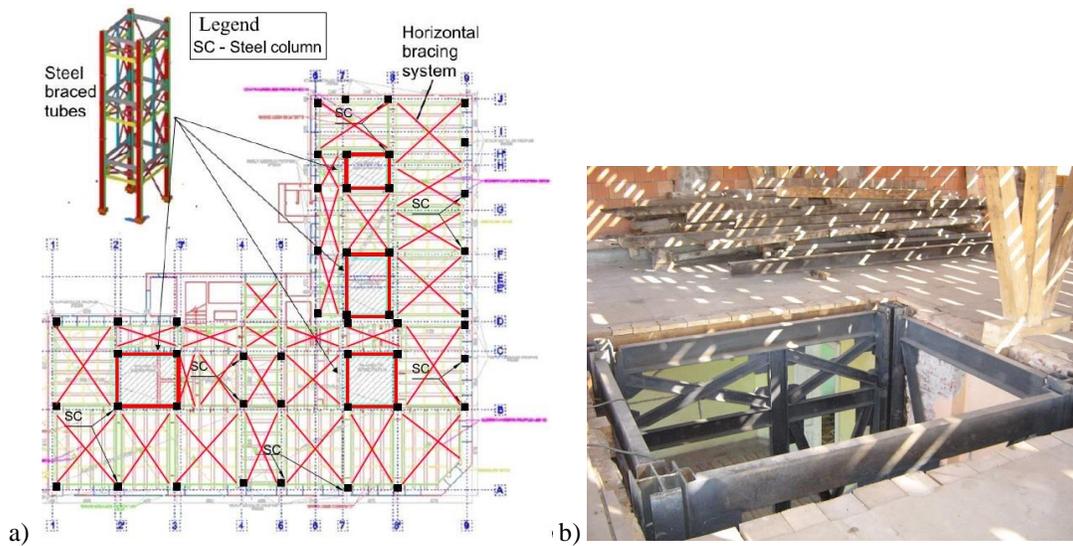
Steel tubes a) positioning; b) execution details of the steel tubes
